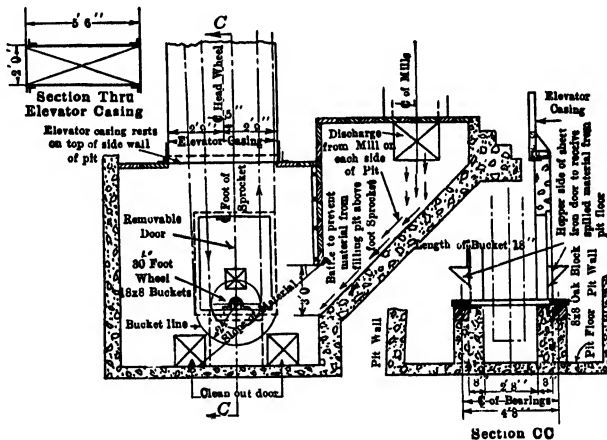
Concrete Pit and Boot for Pulverized Stone Elevator.
